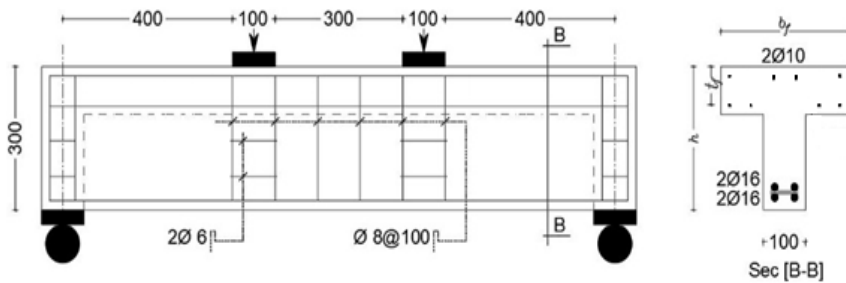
c Specimen with T-cross section with longitudinal steel and without stirrups in flange within shear zone (G2)
